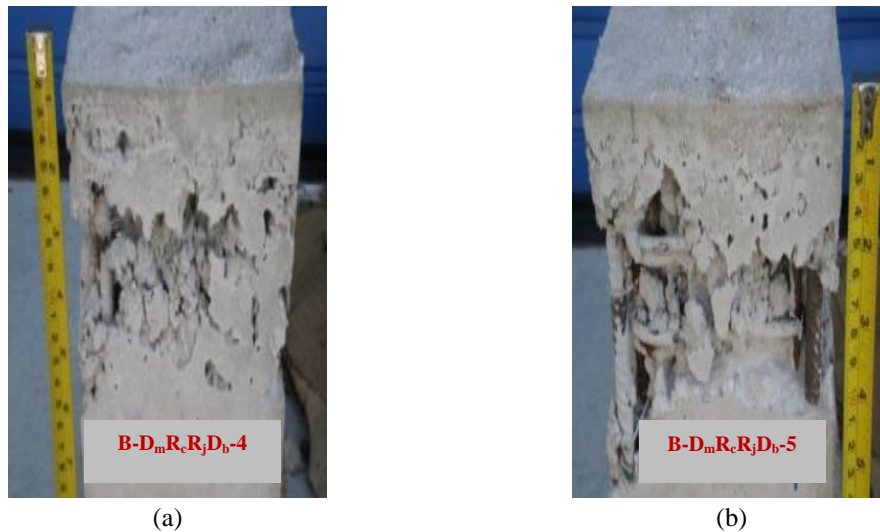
(a) Structural initial damages of specimen B-D_mR_cR_jD_b-4 (b) Structural initial damages of specimen B-D_mR_cR_jD_b-5
